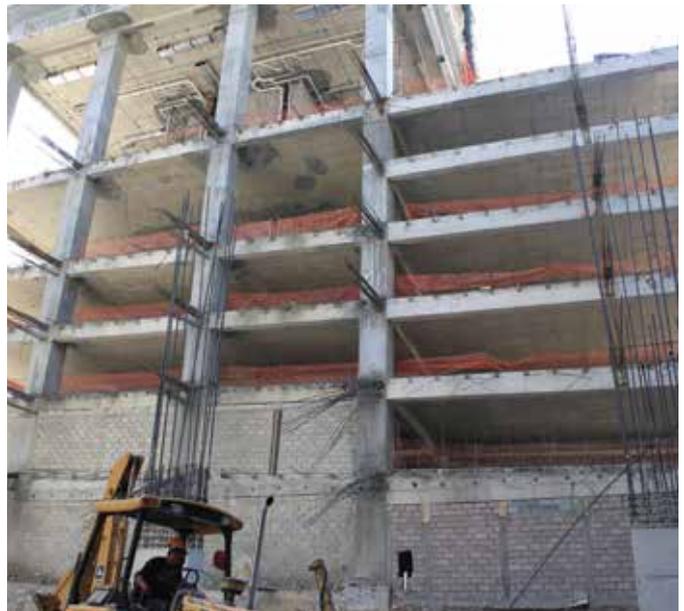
Parking zone construction. Girders and lightened PT concrete slabs are sloped
